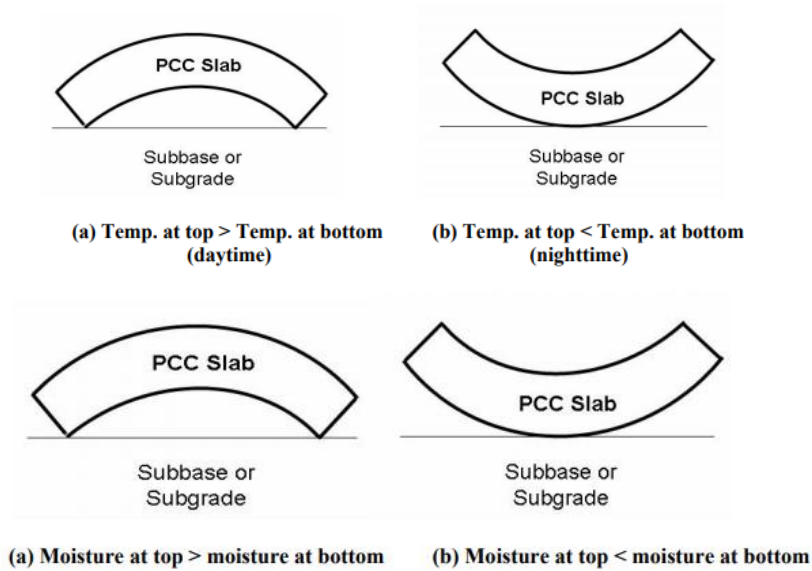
Concrete pavement deformations due to temperature and drying shrinkage [15]
